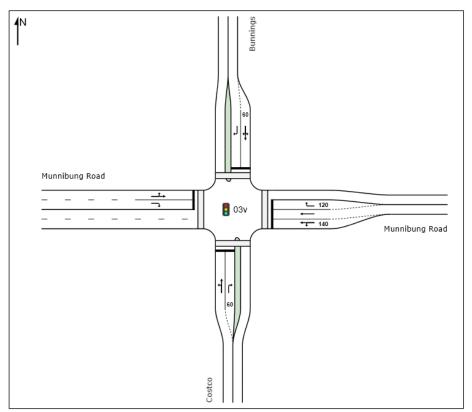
Proposed signalised intersection layout of Munibung Road/Bunnings Access/Costco Access
